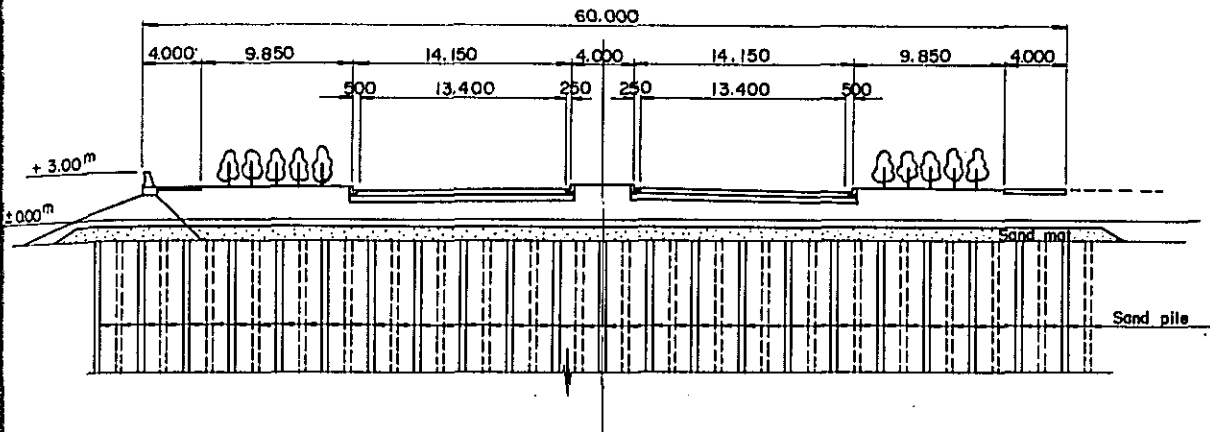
TYPICAL CROSS-SECTION OF EMBANKMENT IN OFF-SHORE
